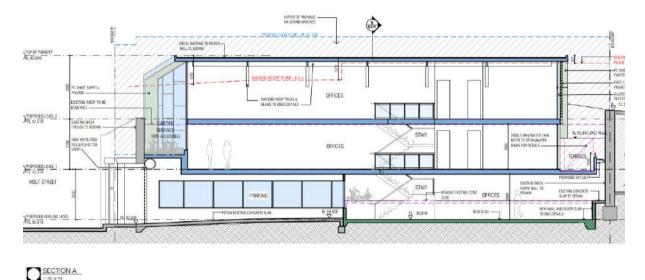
Approved long section detailing the façade and parapet retention to Holt Street, proposed finished levels and the glazing design
